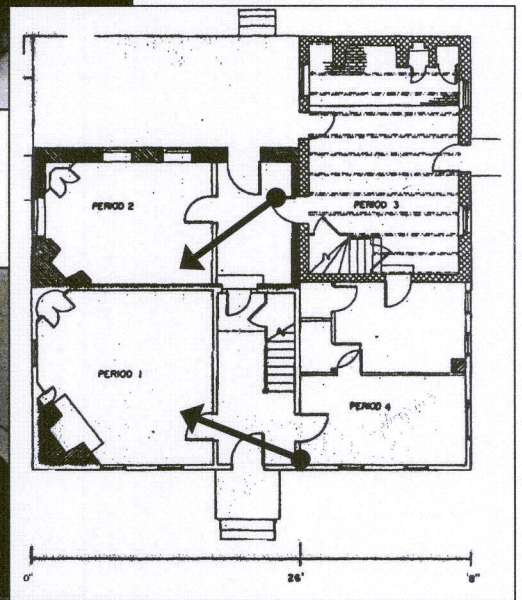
Period 1, first floor, south corner fireplace and west corner cupboard.
